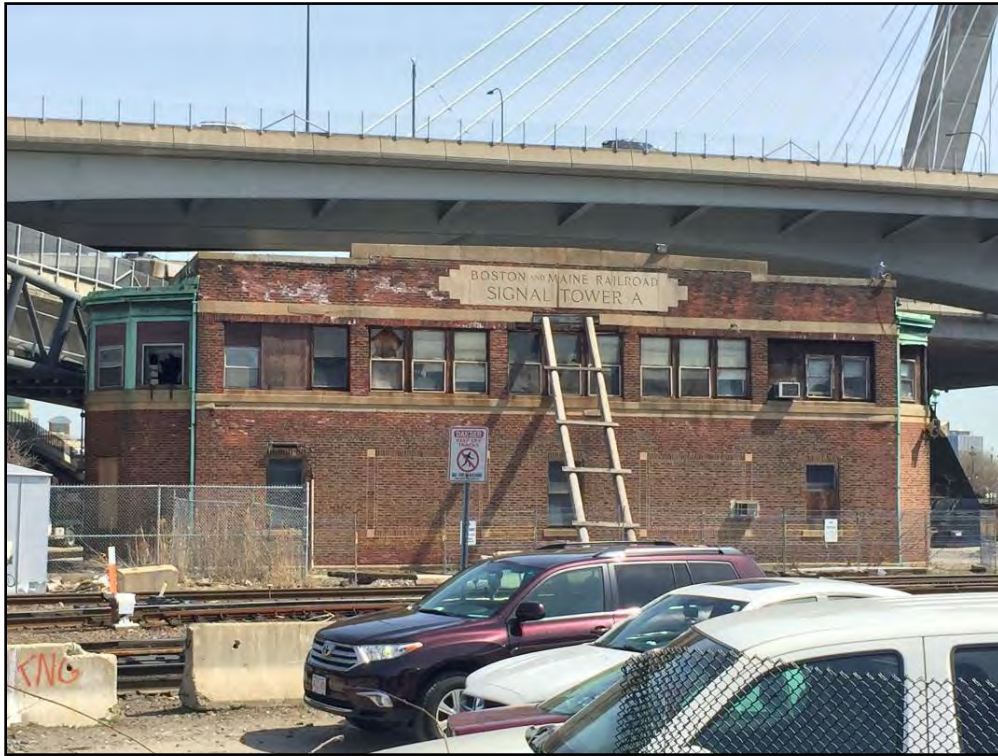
Signal Tower A, looking east at the west (trackside) elevation with temporary timber shoring.
